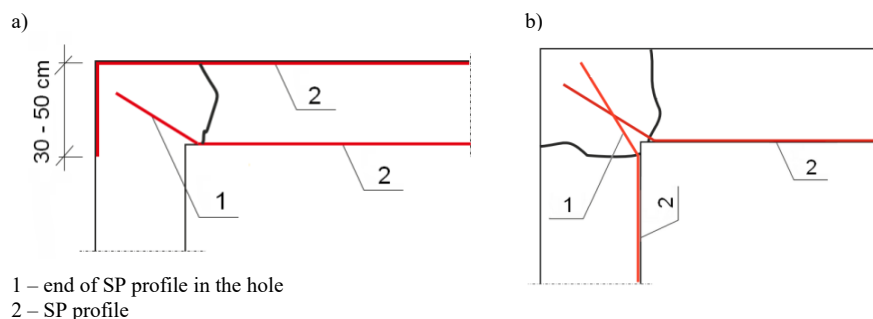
Reinforcement scheme of the wall corner with Saver profiles:
